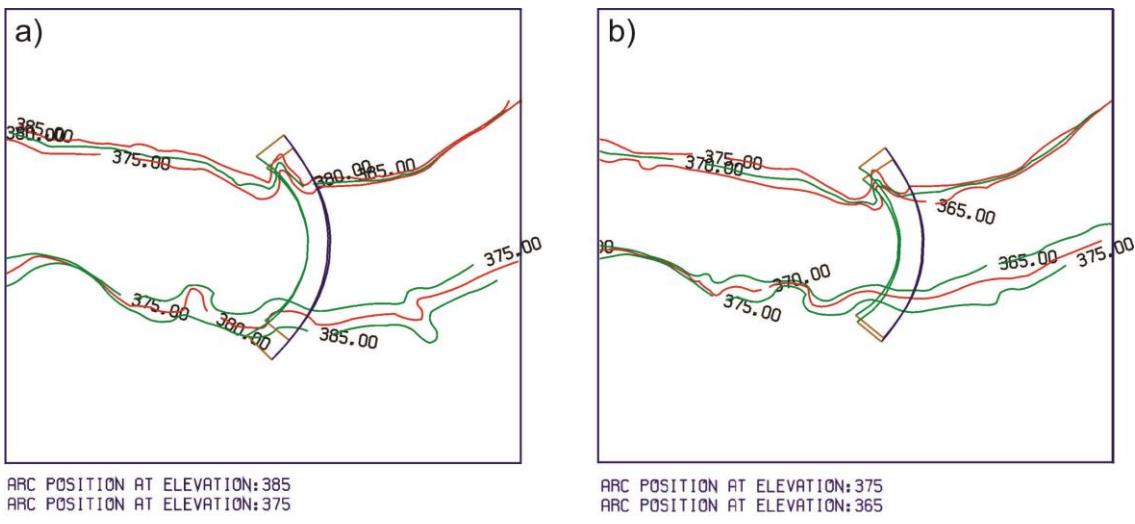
Plan view of the mutual positions of two 10m high arches with contact at 375m: a) horizontal cutting plane at elevation of 385m, and b) horizontal cutting plane at elevation of 365m
